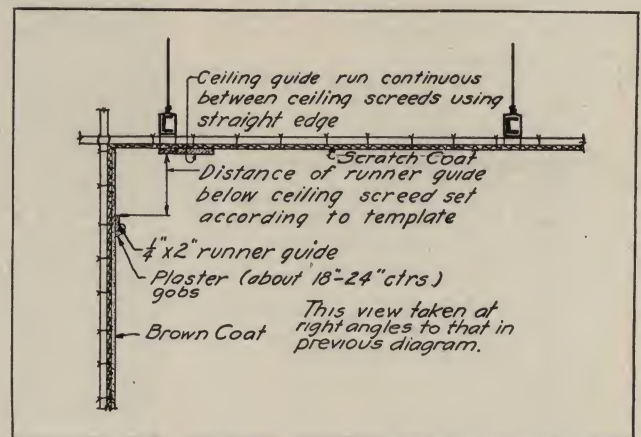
Wood Guides Are Used on Wall and Ceiling When Applying the Template.
